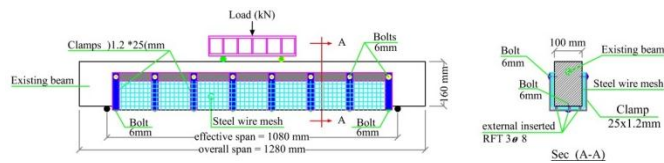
d] External additional horizontal steel bars 3Ø8 with 8 vertical steel clamps distributed uniformly.
